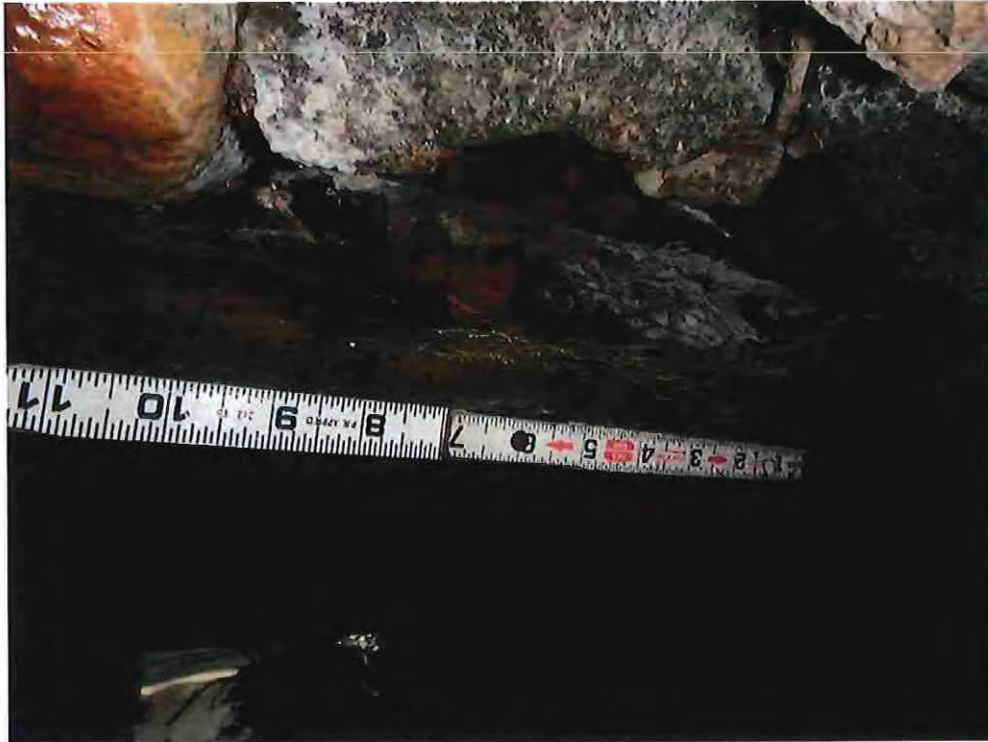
Girders/Beams - Span 2, Granite Slab #8, full width 1/8" transverse crack at midspan.
